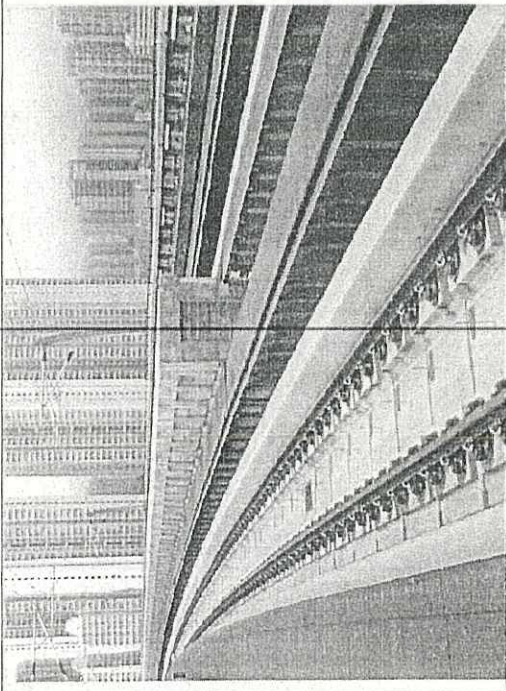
MPS at Section Approaching Tin Shui Wai
